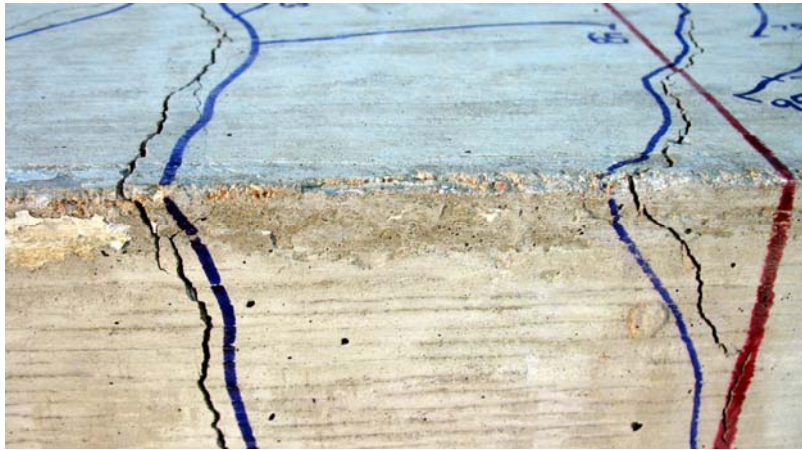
0.08 in. crack at the end of a splice in specimen 11-5-XC2-3. Applied load is 68% of failure load.
